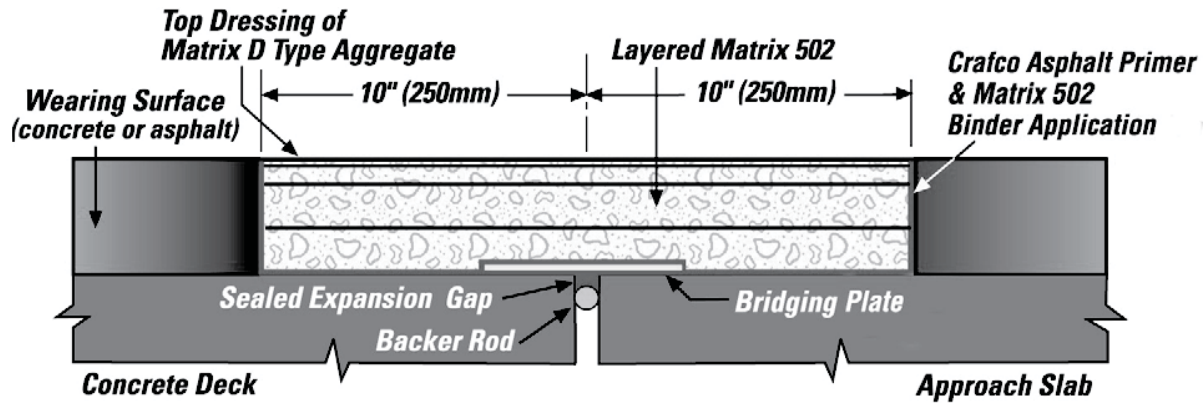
Typical Matrix 502 Asphaltic Plug Bridge Joint System
